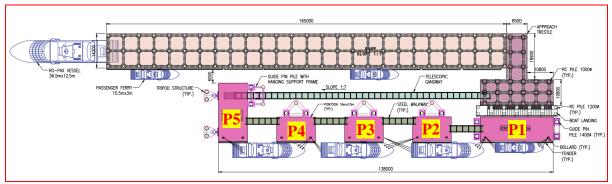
Layout of berthing pontoons and guide pile system at Assi Ghat
